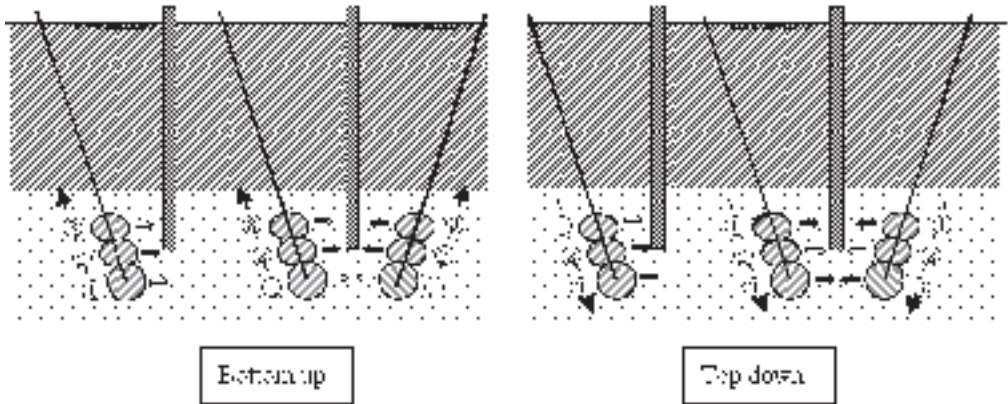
Bottom Up (left) and Top Down (right) Grouting of a Foundation Pile
